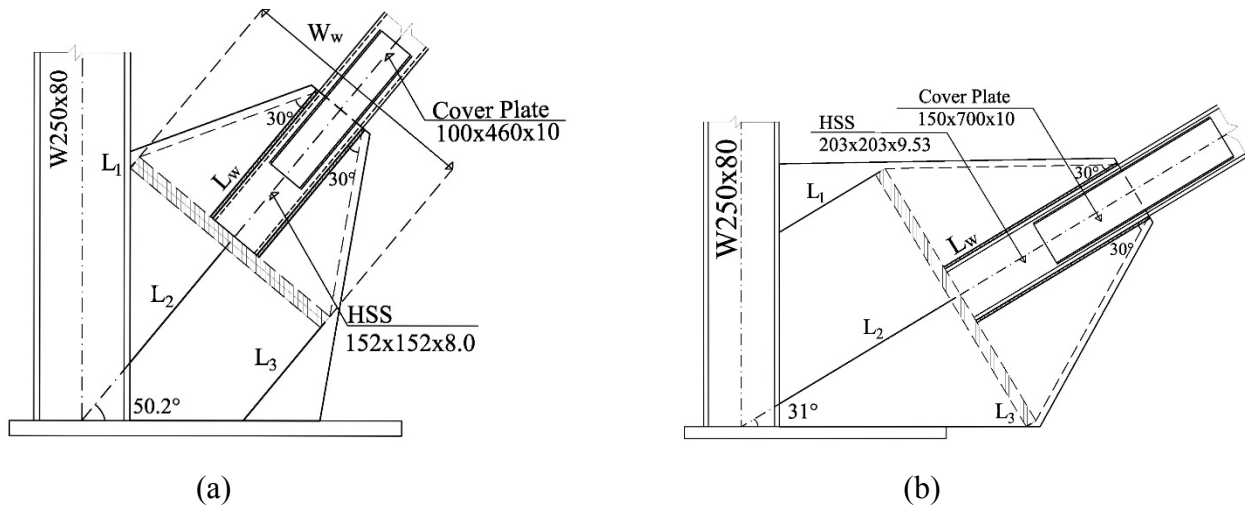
Corner connection detail at ground floor according to CSA/S16-09 (post-retrofit connection of 3-storey CBF, Quebec City): a) E-W direction; b) N-S direction.
